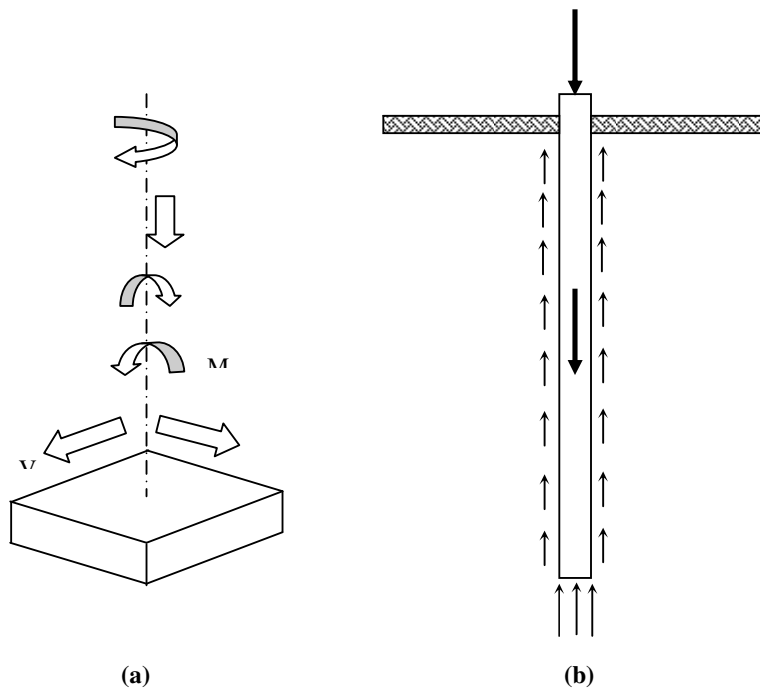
Foundation systems (a) Transferred loadings to the foundation
